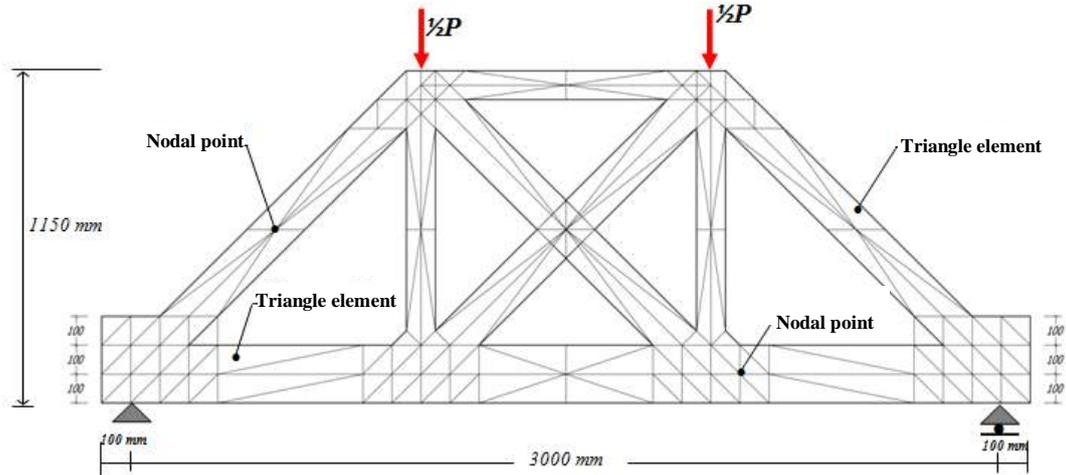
Discretization of Bamboo Reinforced Concrete Bridge Frames
